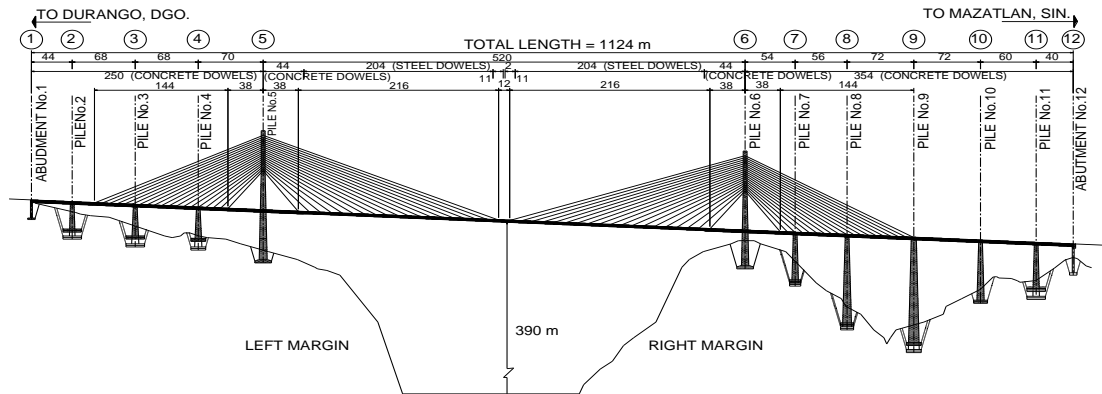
Elevation view of the bridge (Pozos-Estrada et al. 2016).
